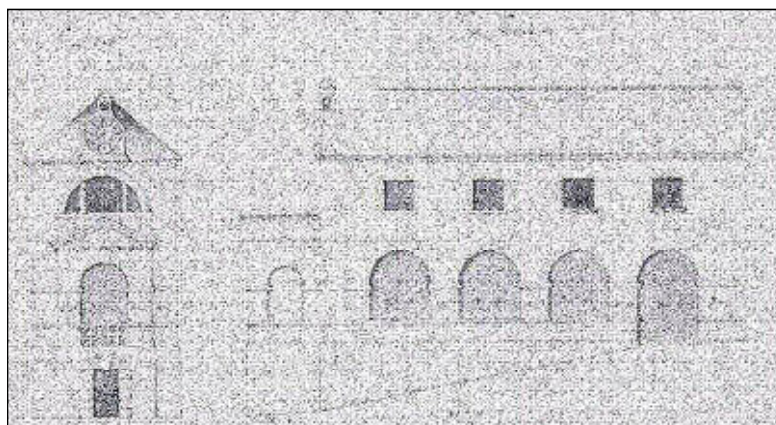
Baker's proposed elevations for Bishop's Castle Town Hall 1745 (Shropshire Archives)
